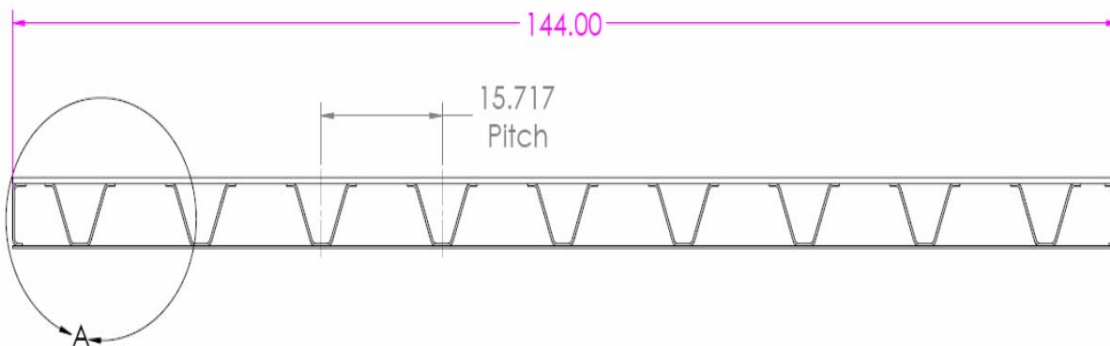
Current Sandwich Panel Design With a 15-Foot Span
